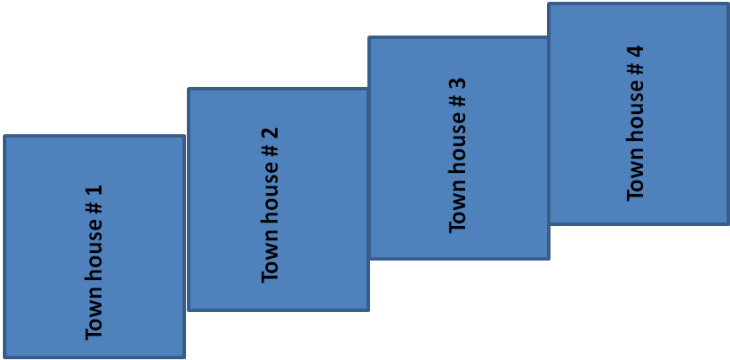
Plan view of the revised town houses layouts (as intended by the city engineer and the design engineer)
